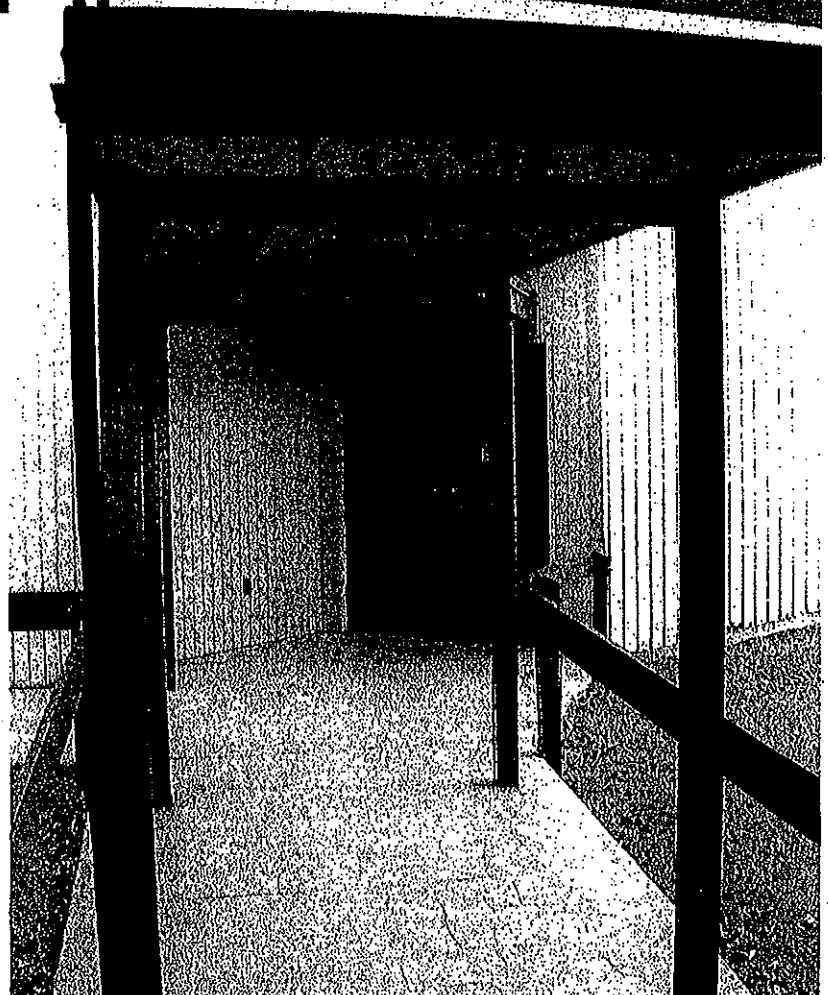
Covered Walkway Consists of Structural Steel Tube Columns and Beams in Addition to Wood Framing
